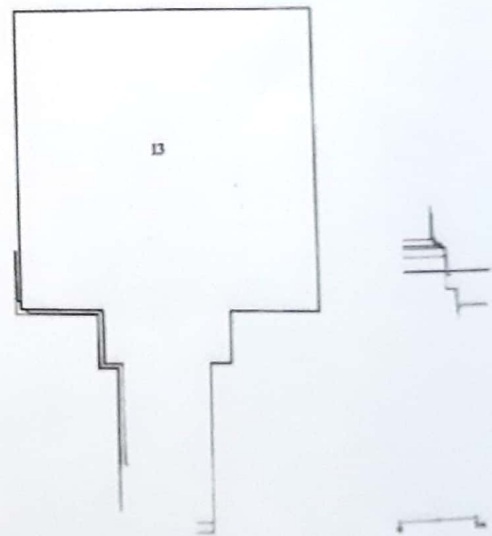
Stupa 13: Plan with detail of the podium's moulding (Drawings by FM).
